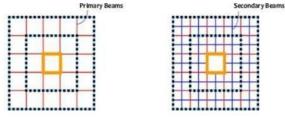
Beams in Tube-in-Tube Systems: Secondary beams help in transferring the gravity loads to the two tubes and the core.
